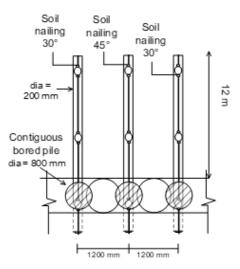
The Arrangement of Secant Pile and Soil Naling
